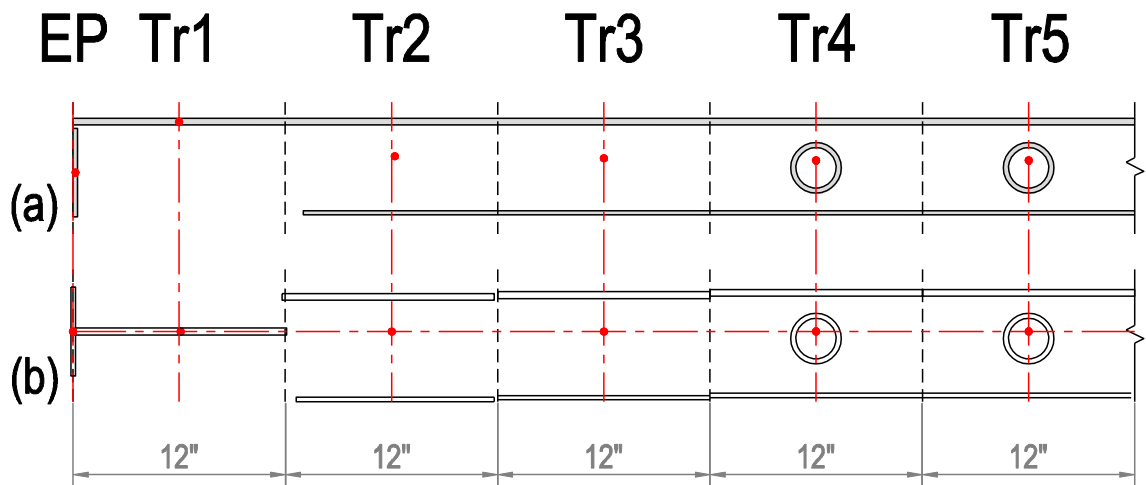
Division of bridge deck into transverse members (a) Transverse members with cover plate (b) Placement of sections in grillage layout
